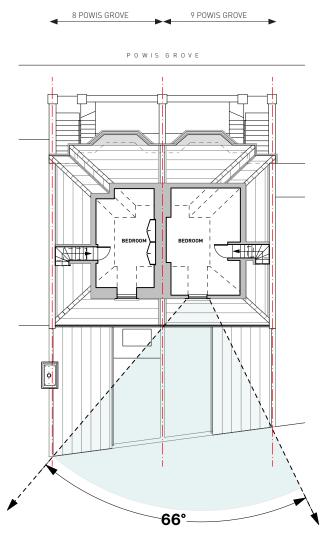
Existing Attic Plan Illustrating Restricted View from Window
